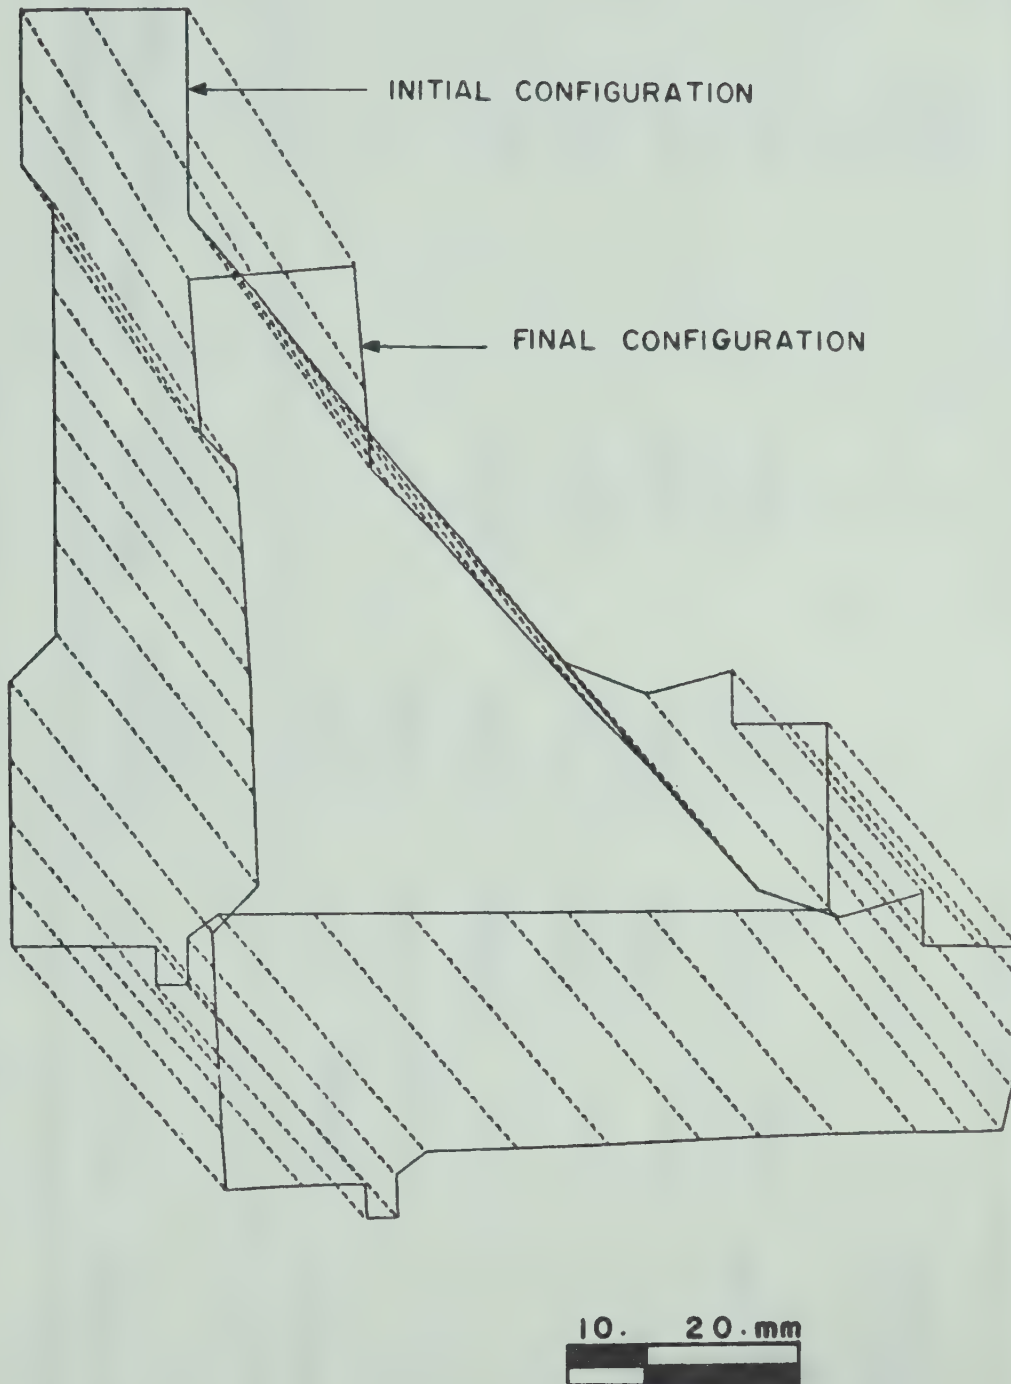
DISPLACEMENTS OF THE DAM FOR GRAVITY AND WATER LOADING PLUS ASSUMPTION OF A CRACK GOING DOWN 1.0H INTO THE FOUNDATION ROCK
